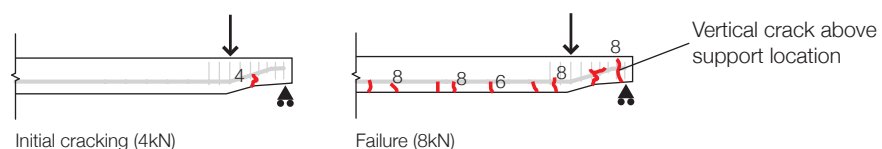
Initial cracking (l) and failure mode (r) in Beam 9\_4\_EC2\_M.
